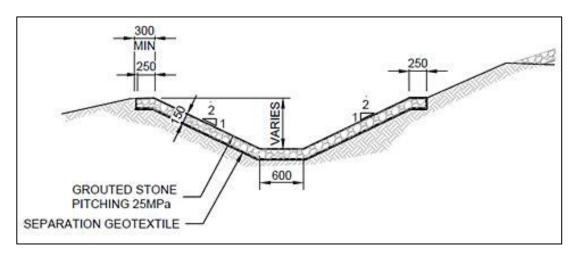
Typical cross section of the toe drains (Drawing 02-T-1229)
